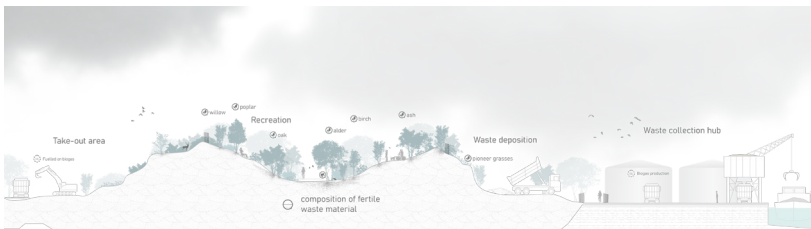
Zoom in on section of waste hill ridge (design part ONE)
